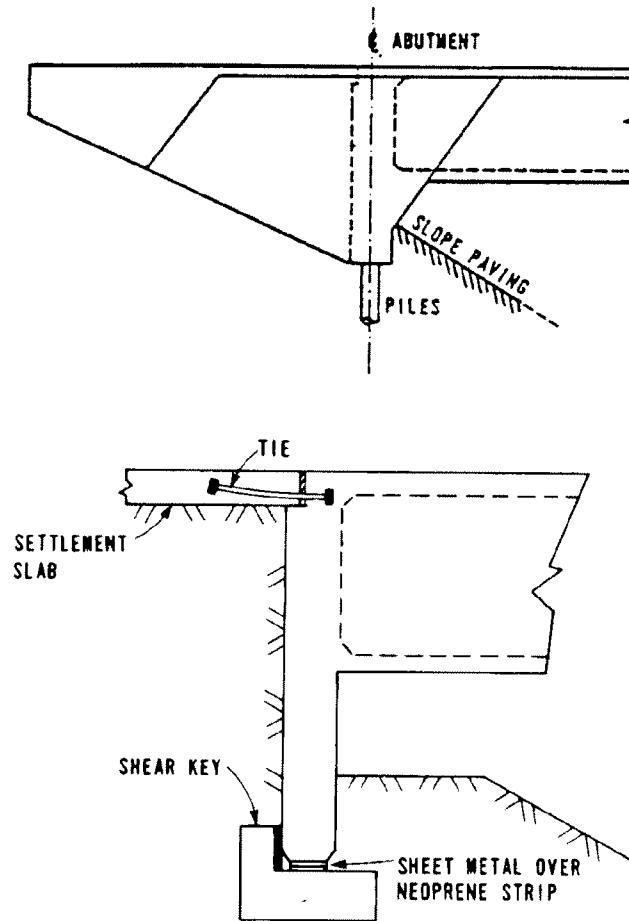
Typical Monolithic Abutment.
